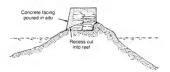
shows a recess cut into the reef and a solid wall built from jute bags filled with concrete and placed in position. When the concrete has set, after about 24 hours, an *in
